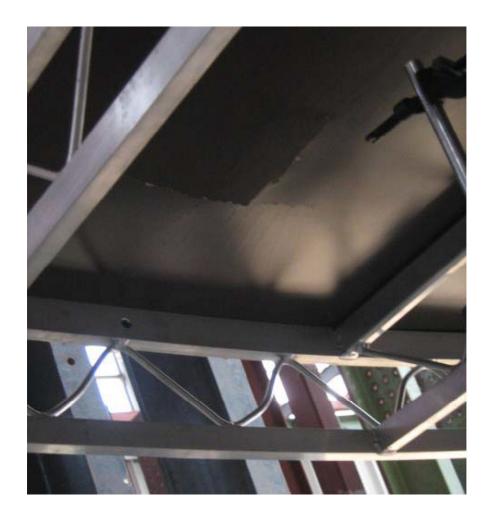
Failure of Timber Platform of Global Truss Performer Stage
